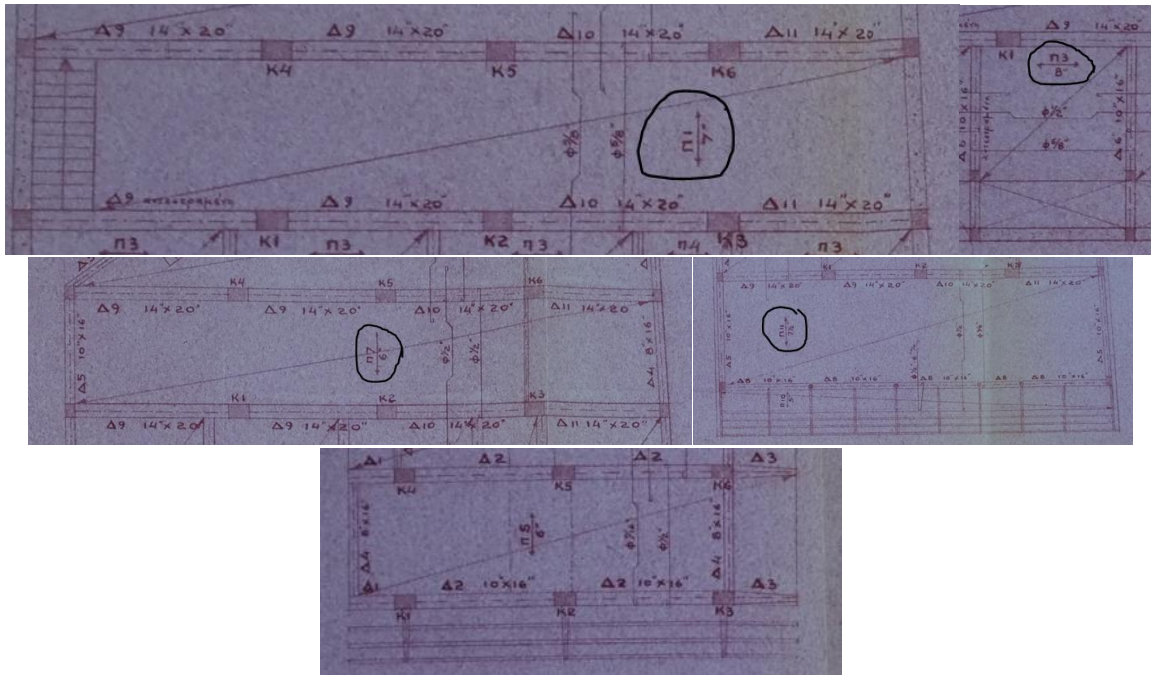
Slab depth based on original drawings: (a) over 2nd basement, (b) under ground floor, (c) above ground, (d) typical floor
